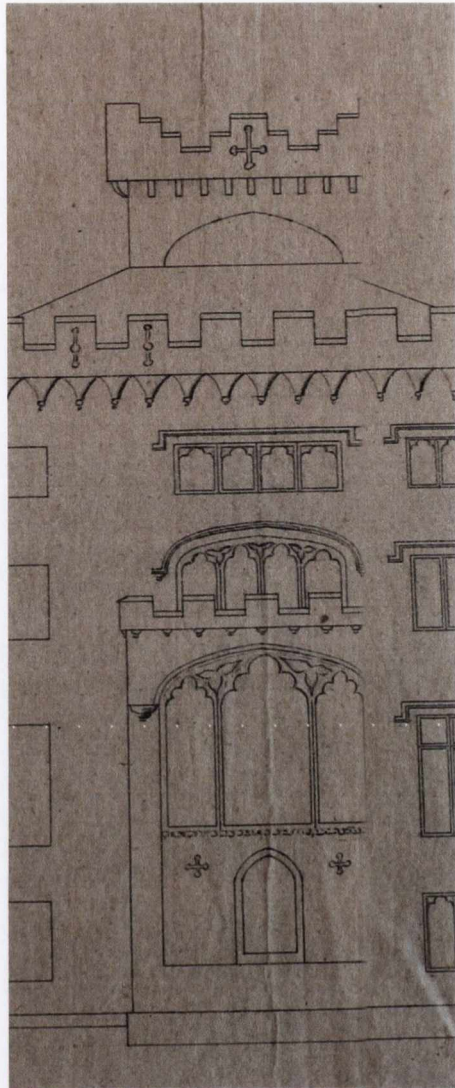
Charleville Castle, portance detail from sketch elevation of north façade, attrib. to Francis Johnston, [1800–1801], IAA, RIAI Murray Collection, 2/46.197, courtesy of the Irish Architectural Archive.
